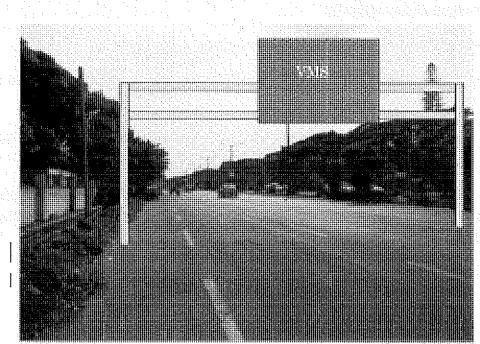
Proposed Location of VMS at Hanging Bridge
